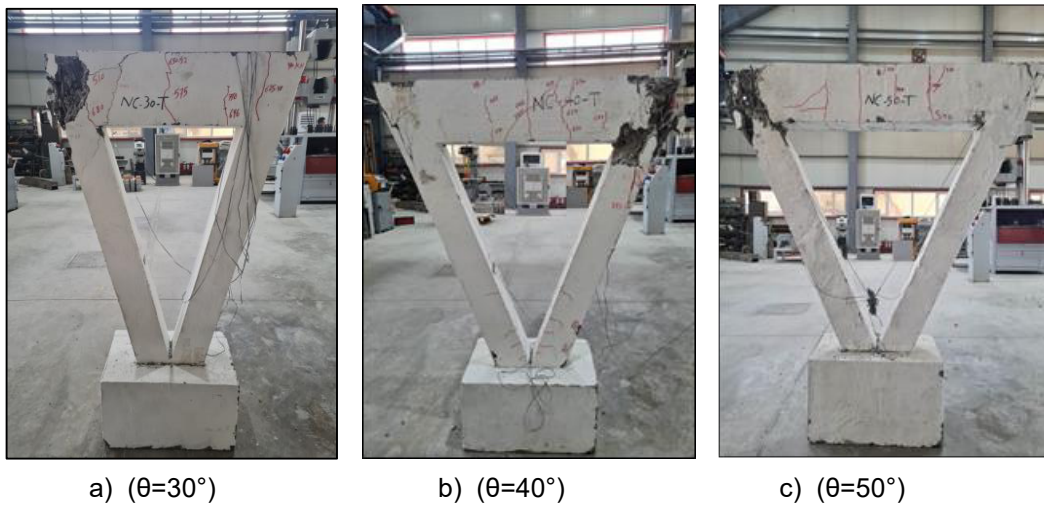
Damage development for V-shaped normal concrete columns with tie beam.
